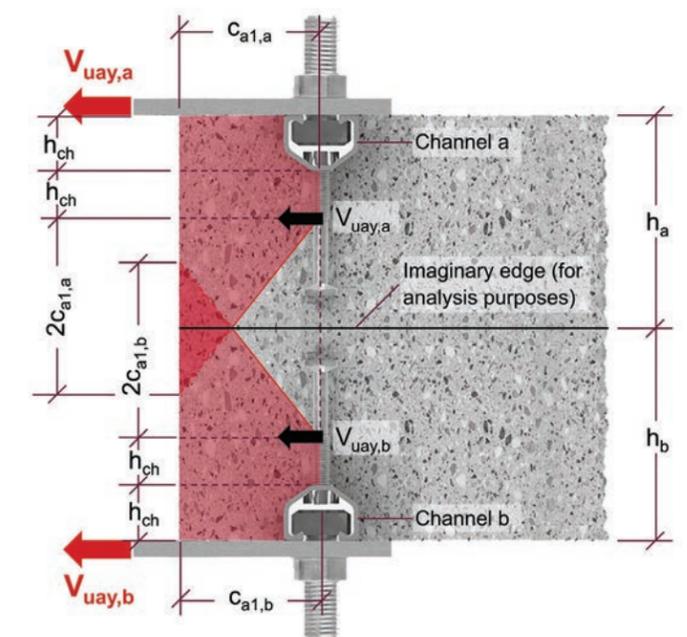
Top and Bottom Channel: TOS under BOS -Perpendicular Shear — Section View.
